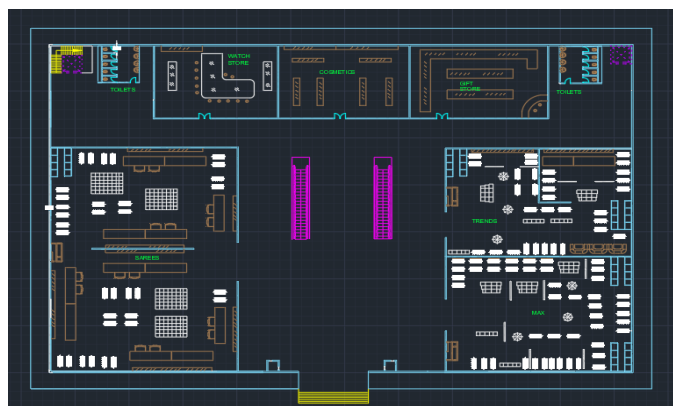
Ground Floor Plan Fig 02: First Floor Plan
